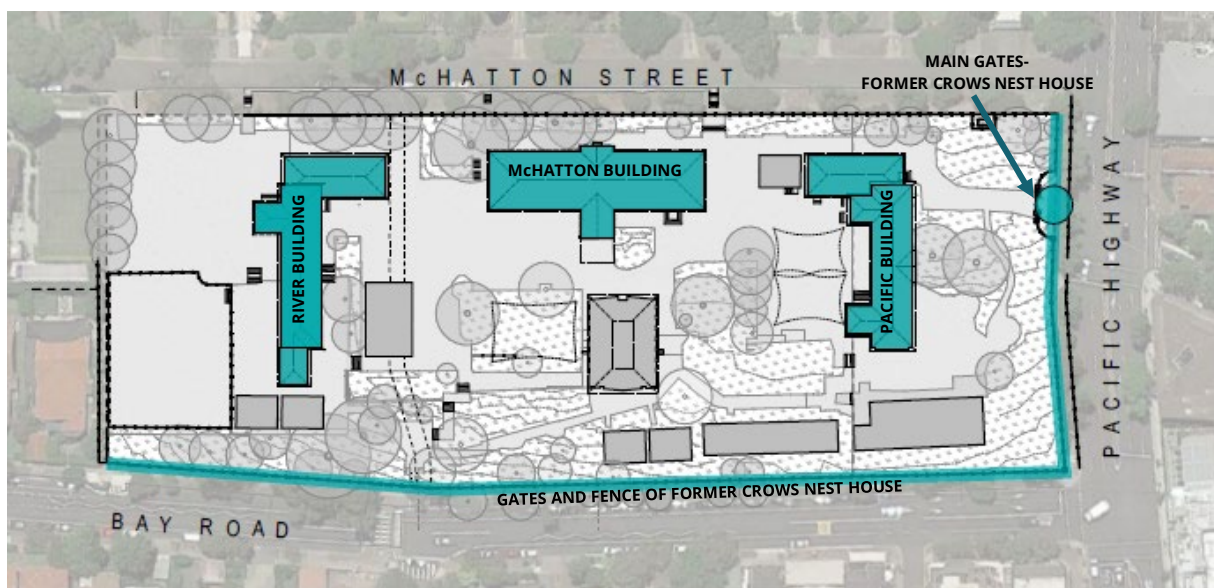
Plan indicating s170 heritage Items within NSPS Site (Source: Fulton Trotter Architects with Curio additions)
